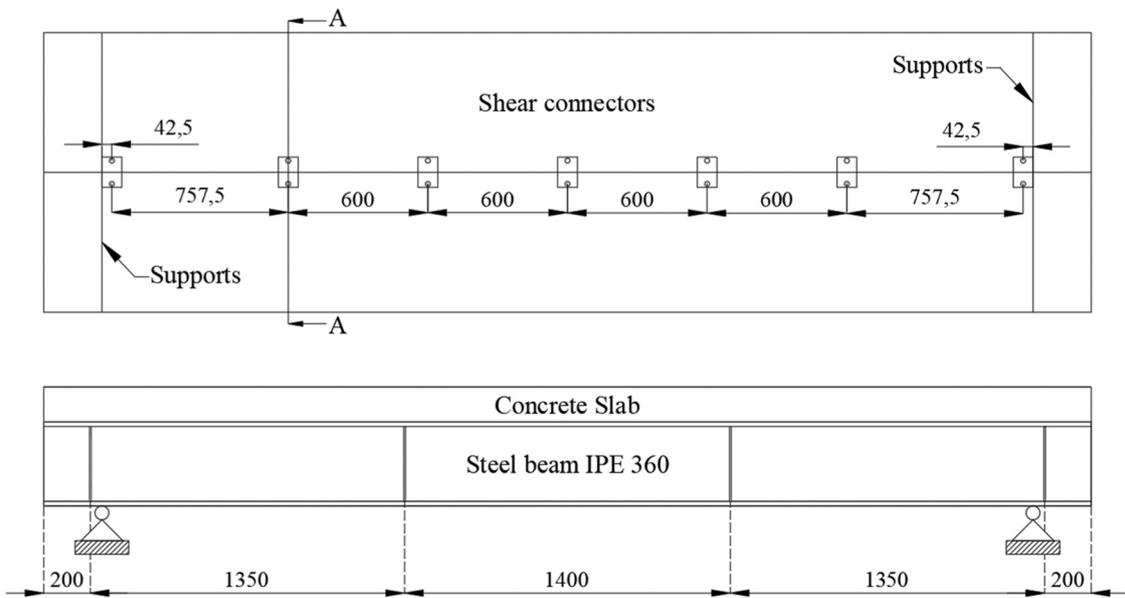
Geometric configuration of the steel-concrete composite beams tested at room temperature (dimensions in mm).
